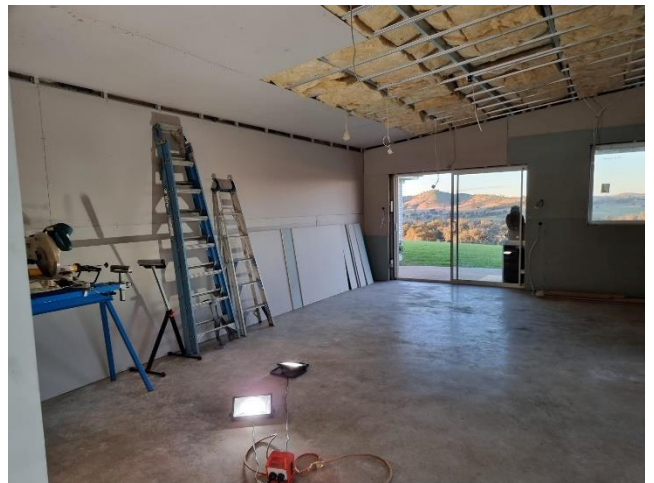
Wall and ceiling lining installed for fit-out (client supplied)
